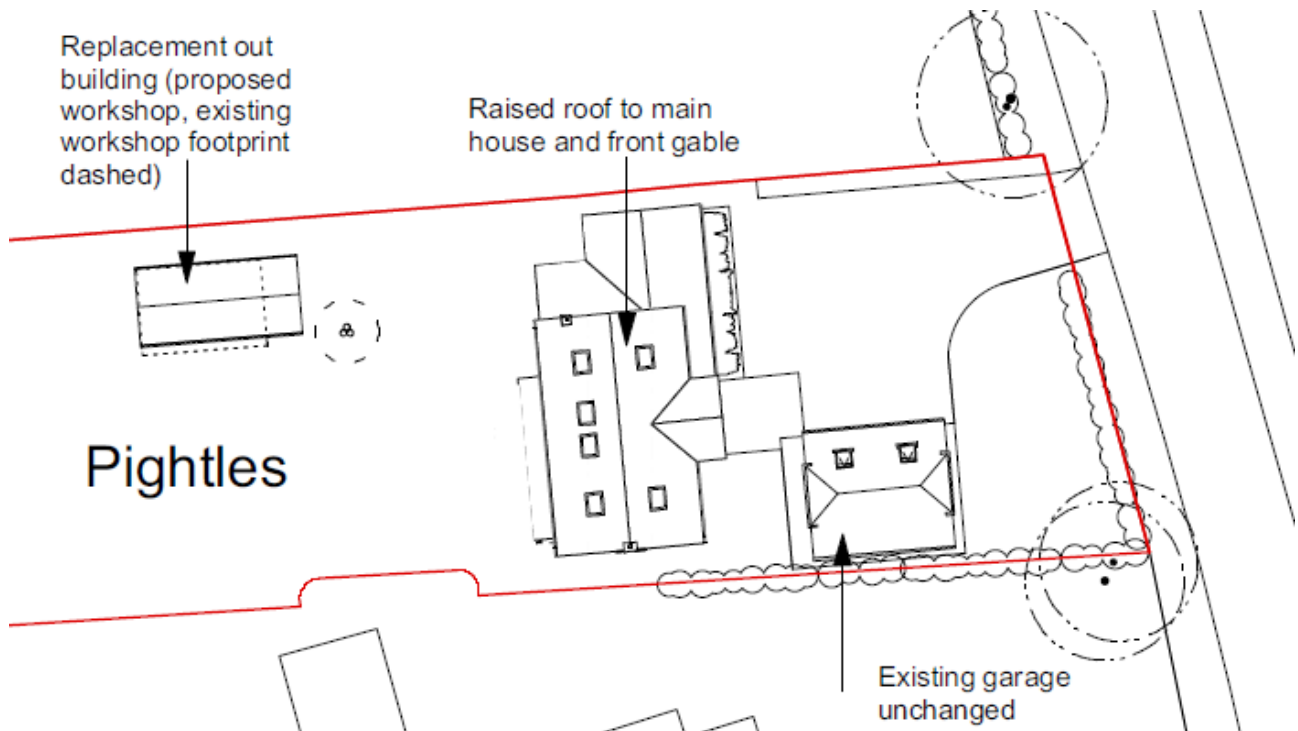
Latest approved block plan for house extensions (18/02443/HOUSE)
